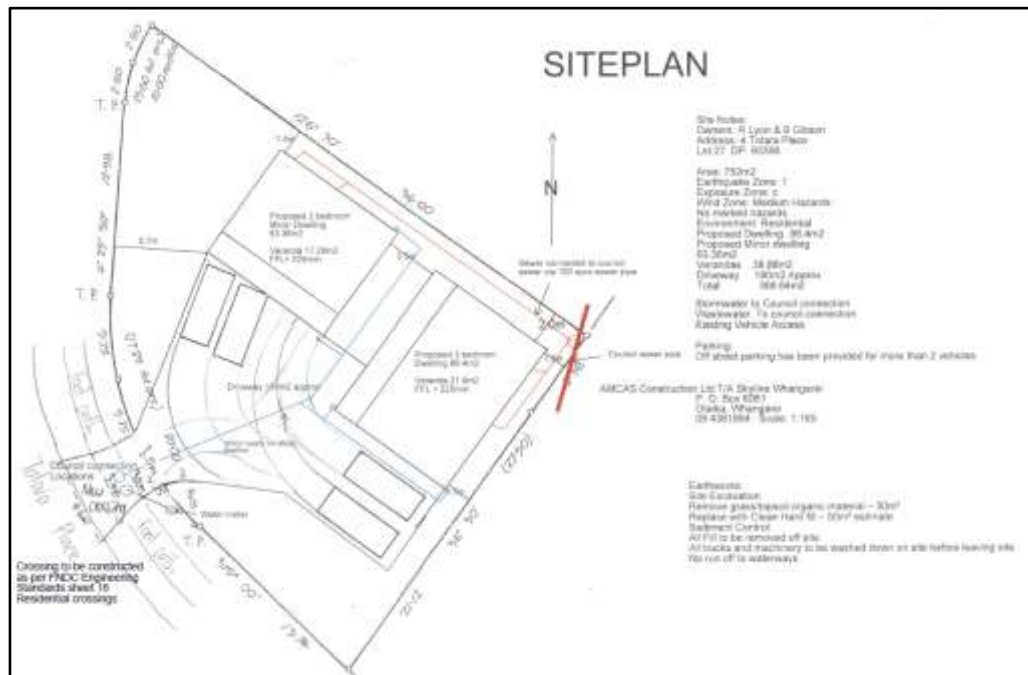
Proposed site plan (Source: Skyline Whangarei).
